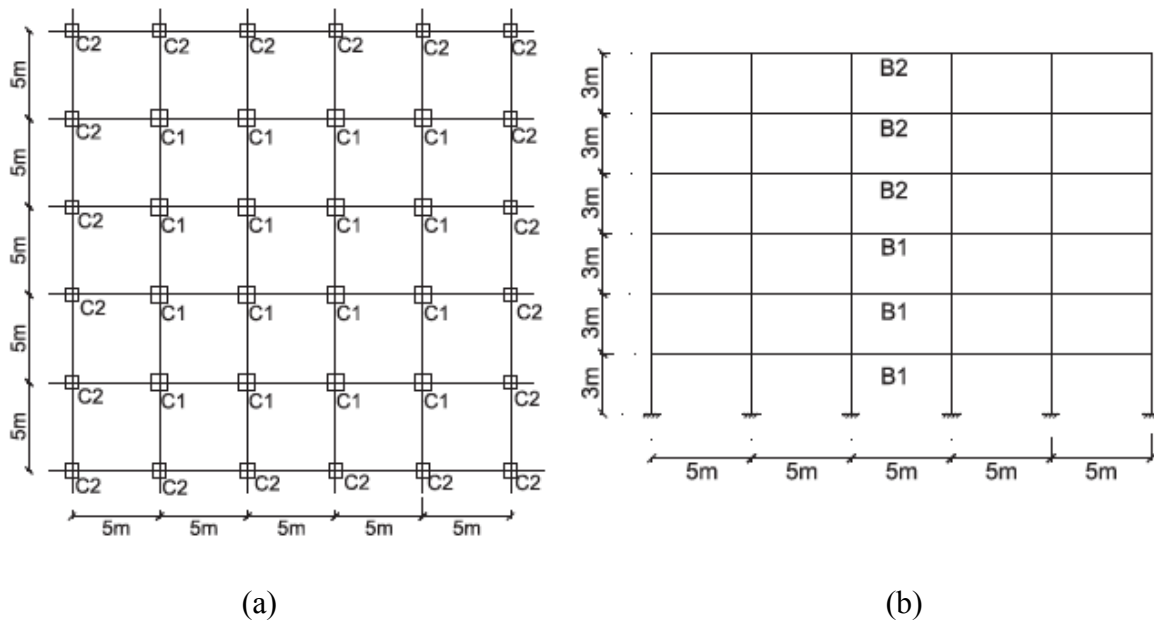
Typical building configuration (a) Plan, and (b) Elevation
